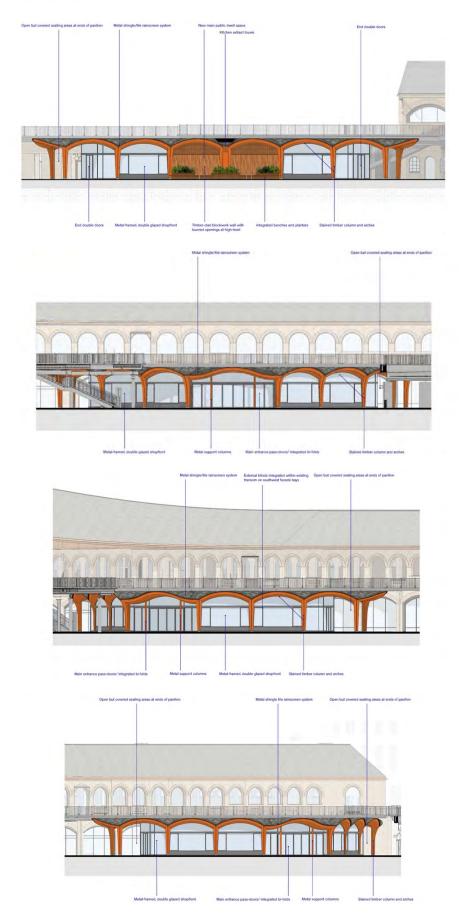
The southwest elevation and model perspectives of the pavilion serves to extend the language of the segmental arcading to define a clear entrance to the pavilion overlooking the more defined new yard area to the south-west corner of the site.
